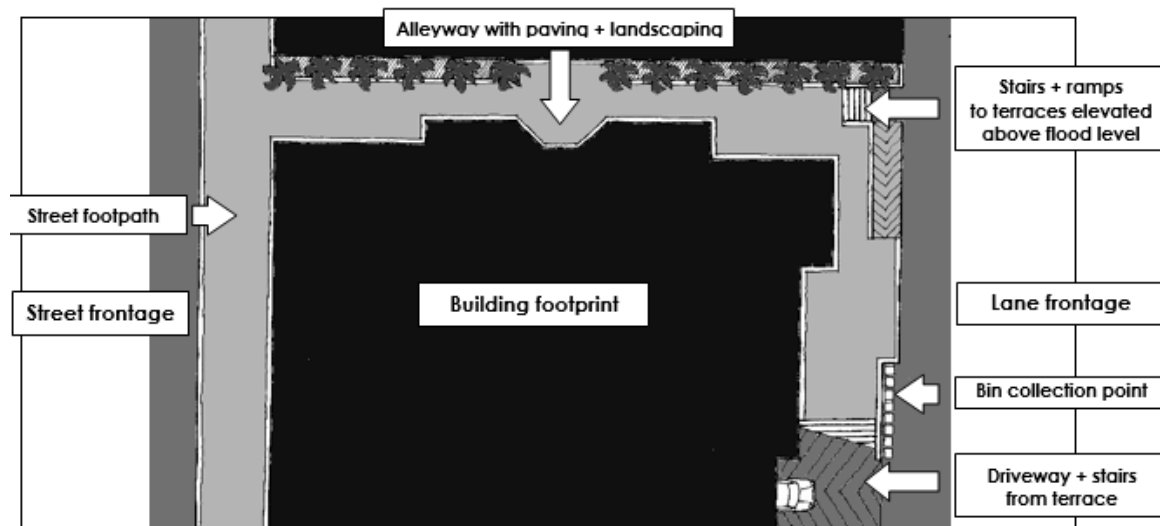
Site plan highlighting areas that should be landscaped Plan illustrates a typical property between Terrigal Esplanade and Hudson Lane
